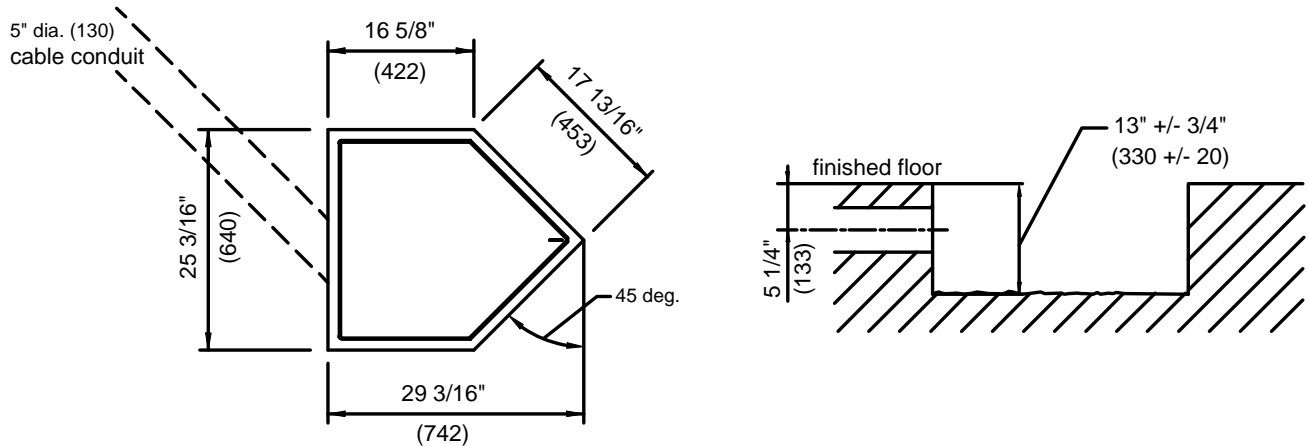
Alternate Conduit/Duct Cable Access Plan and Section at Pull Box
